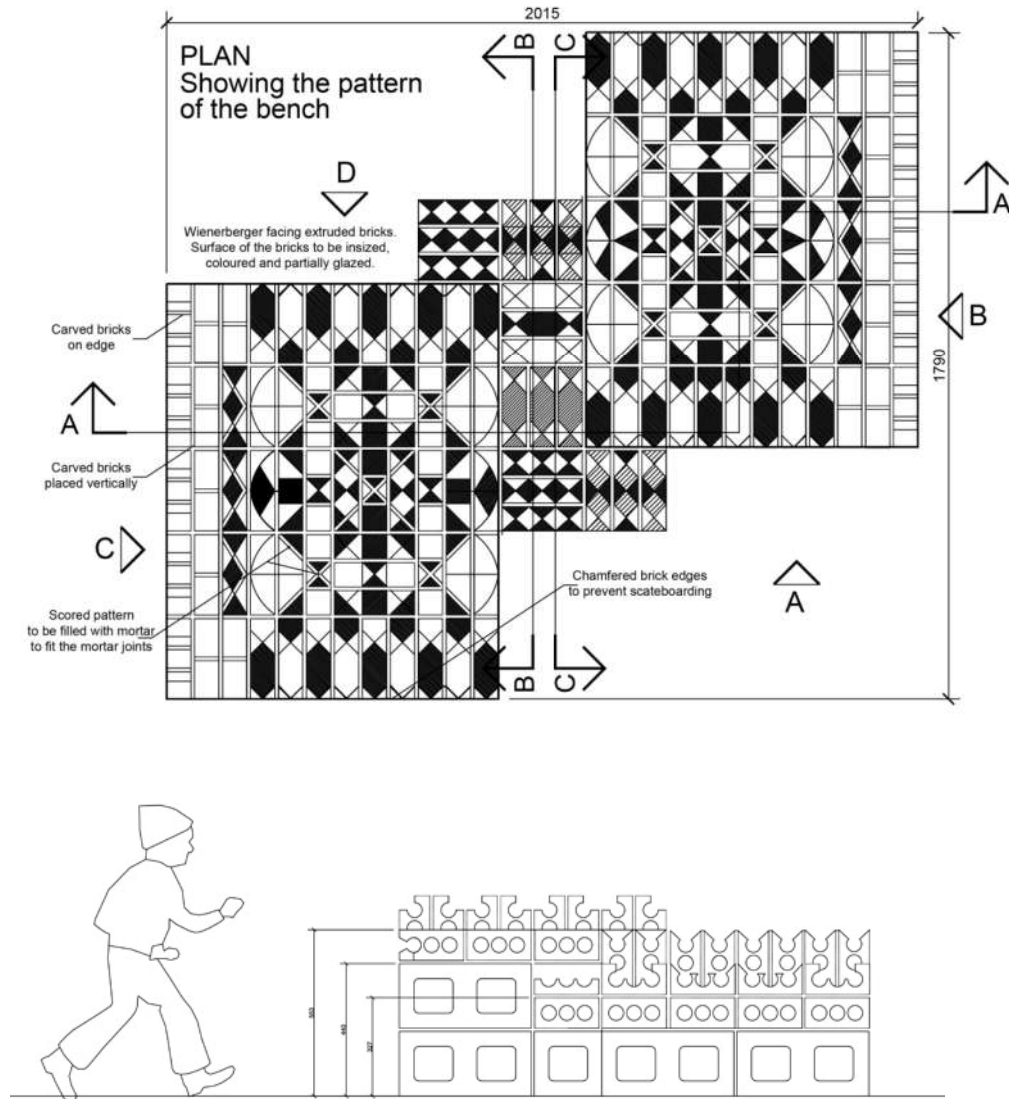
Plan and elevation drawings of the bench, produced for the brick contractor
